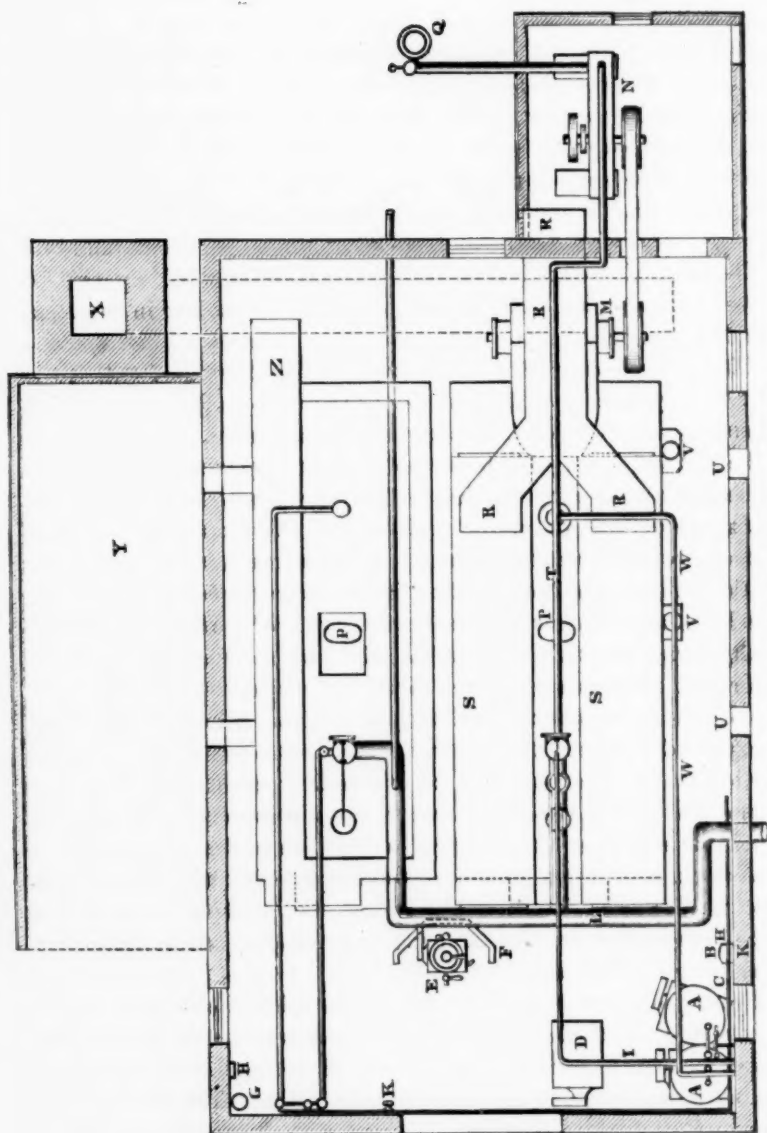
GROUND PLAN OF BOILER-HOUSE.
